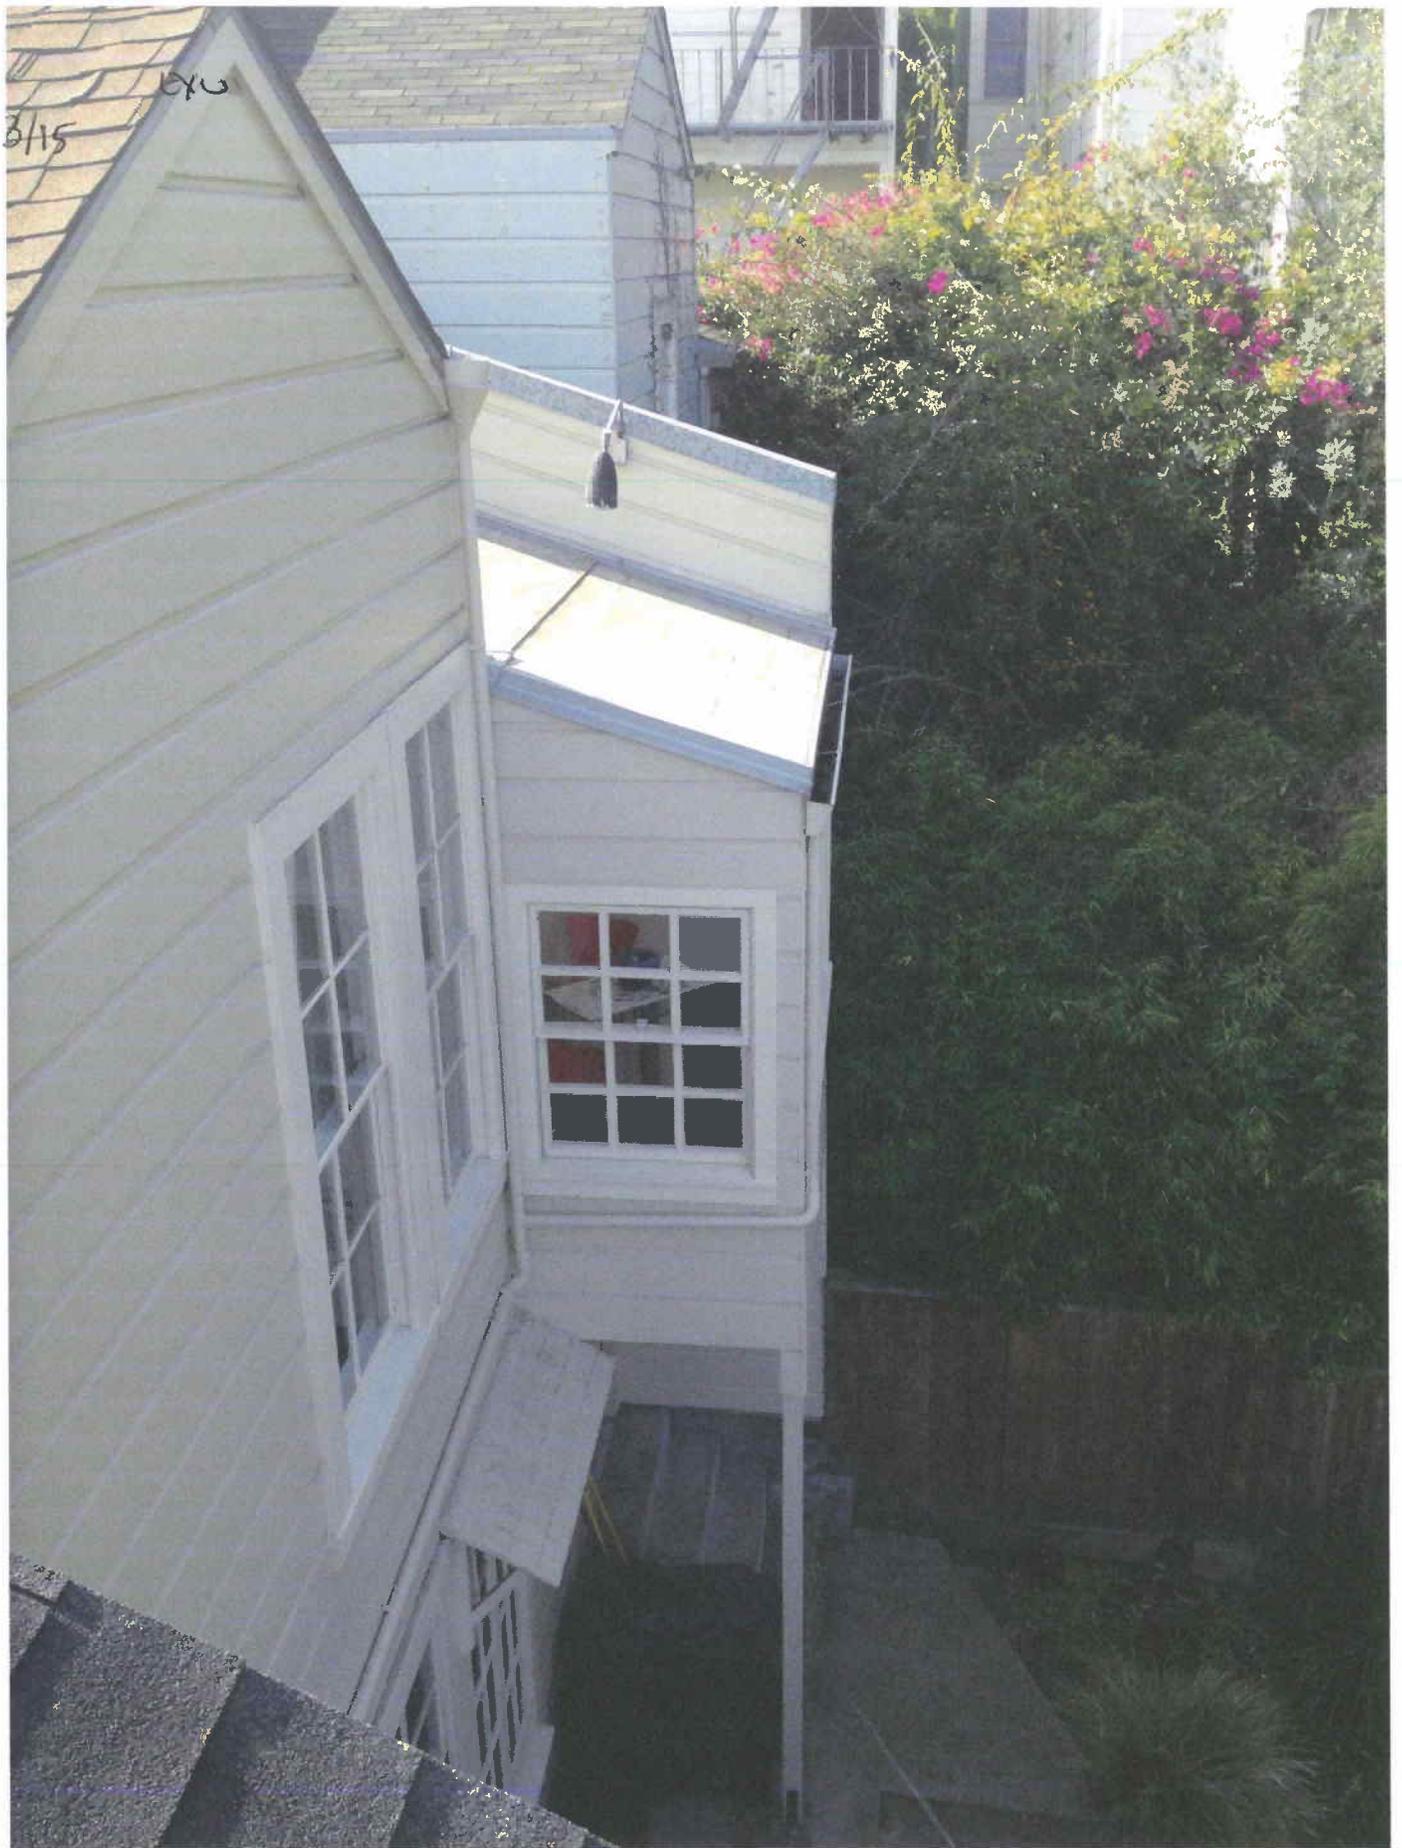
REAR ELEVATIONS TO WEST, WOOD HORIZONTAL SIDING.
